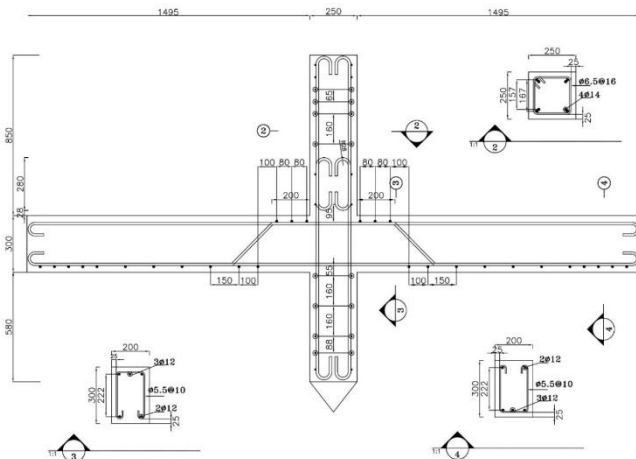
Dimensions and reinforcement details of interior beam-column joint of Specimen SC2
